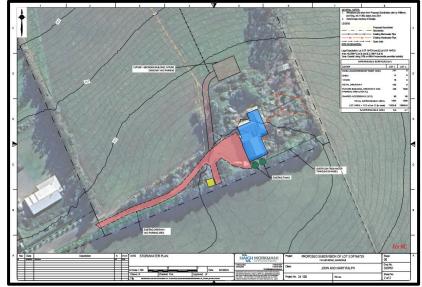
Site Plan showing location of proposed future building on Lot 1. Source: Haigh Workman.
